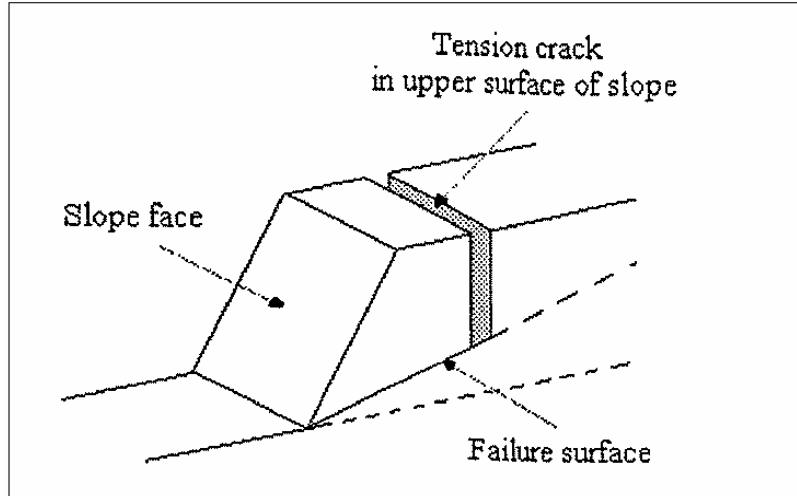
Geometry of a plane slope with a tension crack in its upper surface
